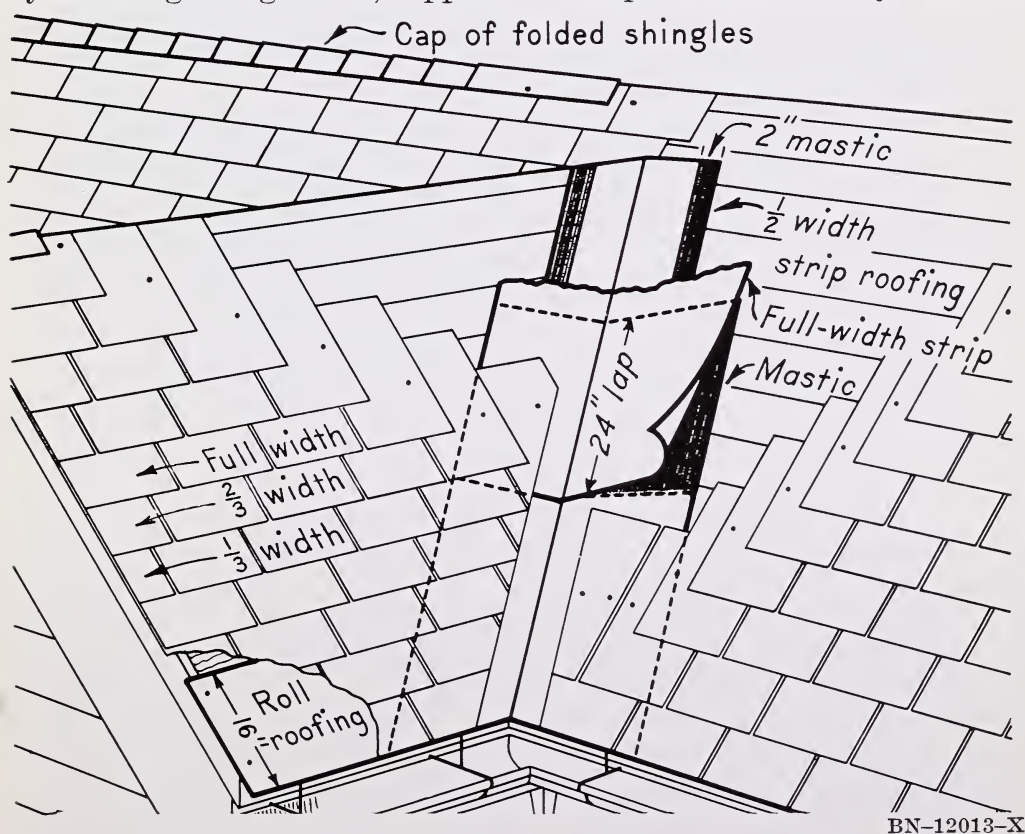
Installation of ordinary asphalt shingles. In general, valley construction details apply to all types of shingles.
